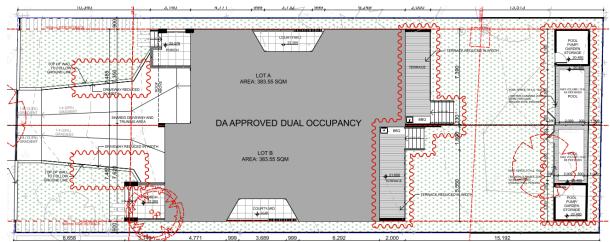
Extract of the initial proposed site plan, drawing #A100, issue B, dated 10 May 2021.
